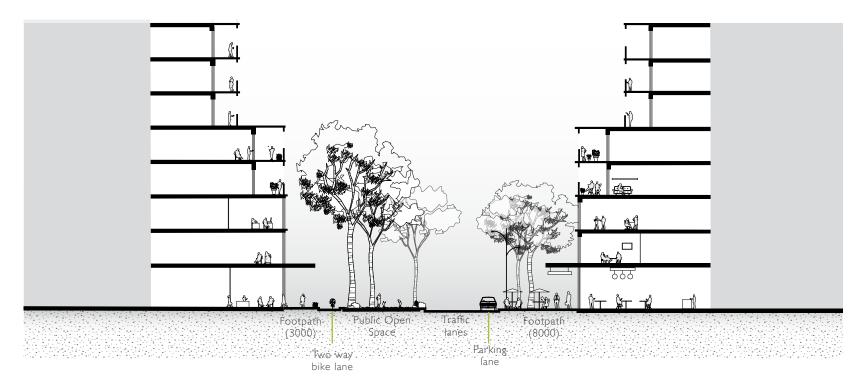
INDICATIVE CROSS SECTION OF BUCKHURST STREET GREEN SPINE
